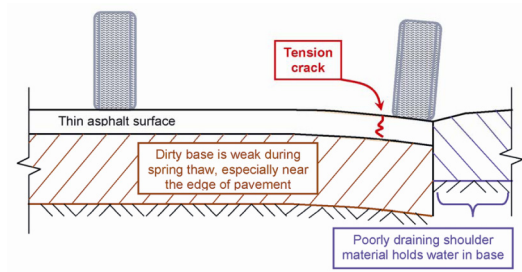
Schematic view of cracking at the edge of pavement [4]
